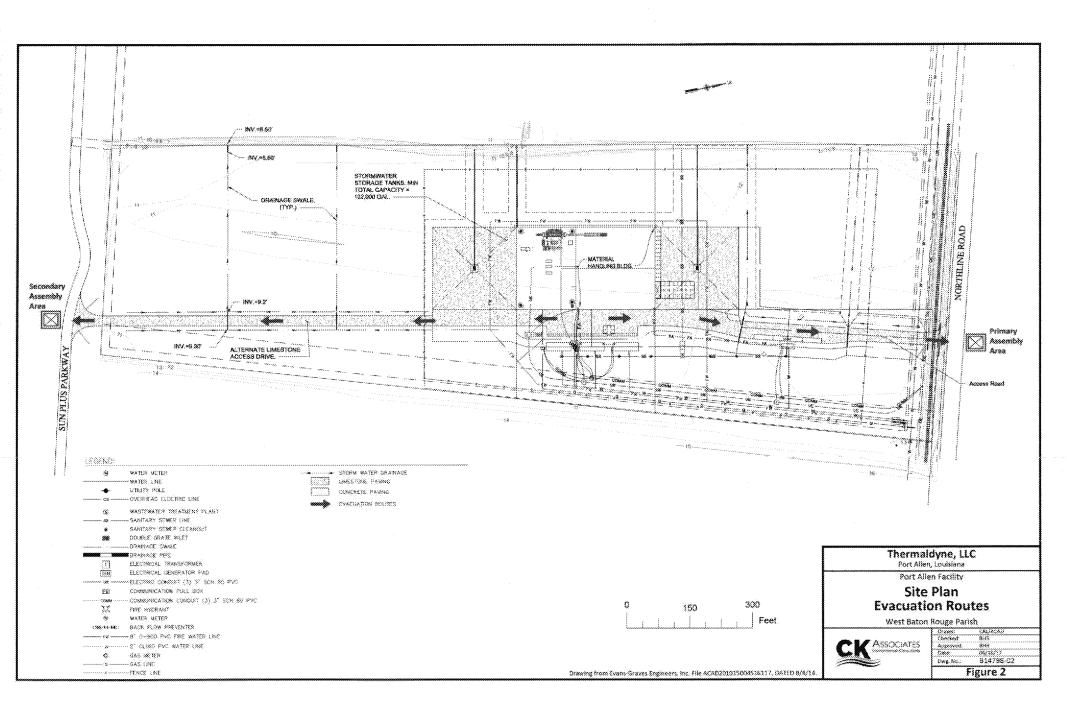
SITE PLAN AND EVACUATION ROUTES
